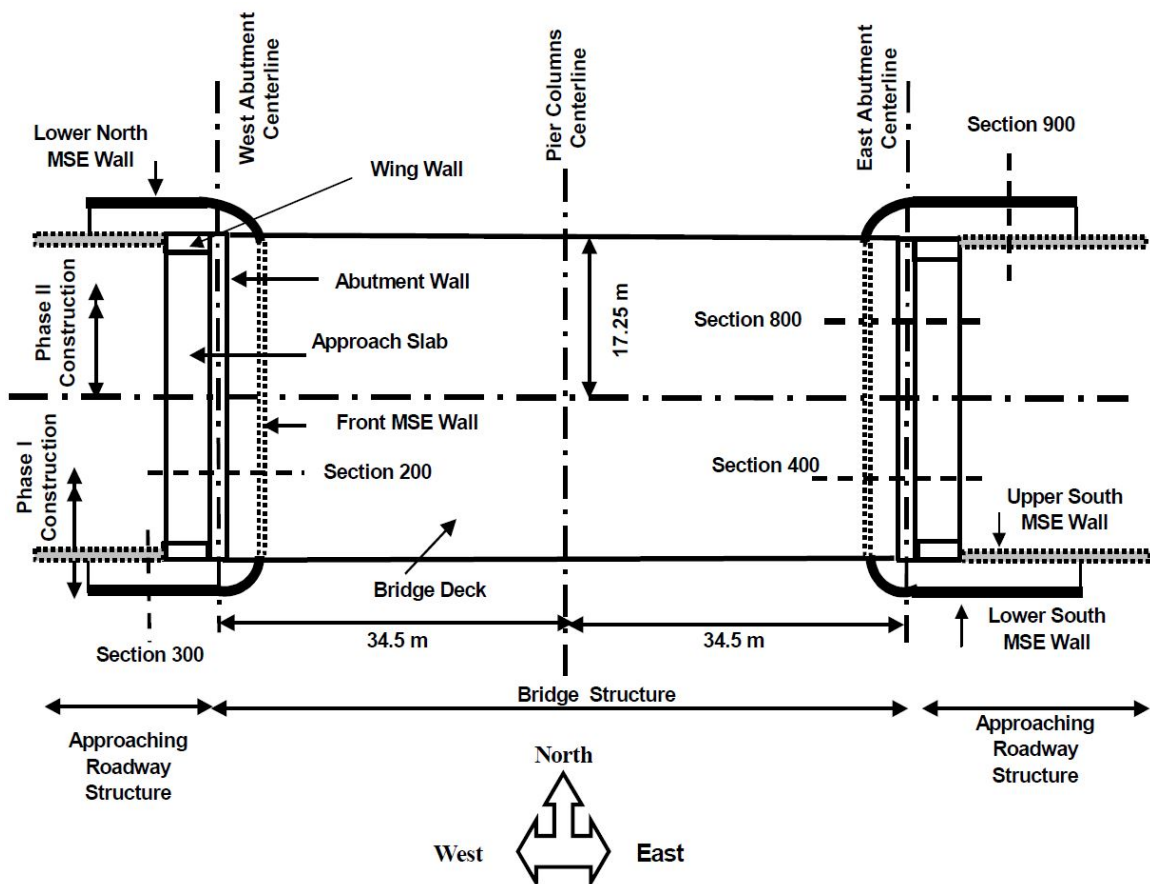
Top view of the Founders/Meadows Parkway Bridge (from Abu-Hejleh et al. 2000).
